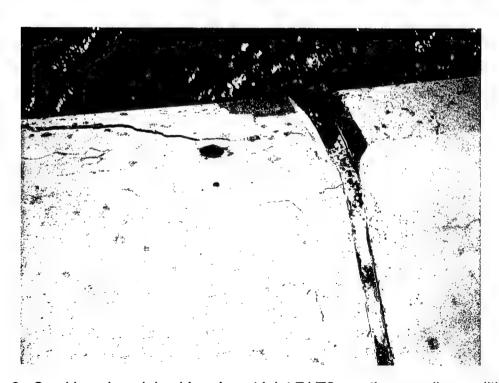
Cracking along lakeside edge at joint 71/72, south seawall monolith S72
